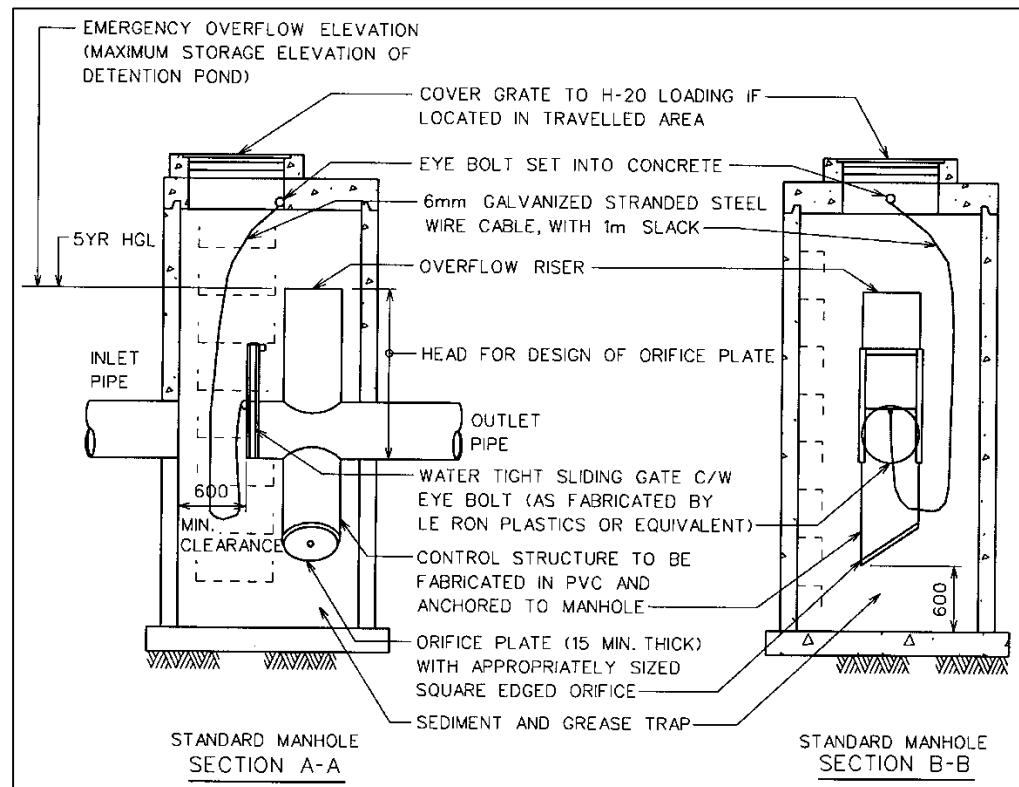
Outlet control structure detail (Master Municipal Construction Documents, 2009)
